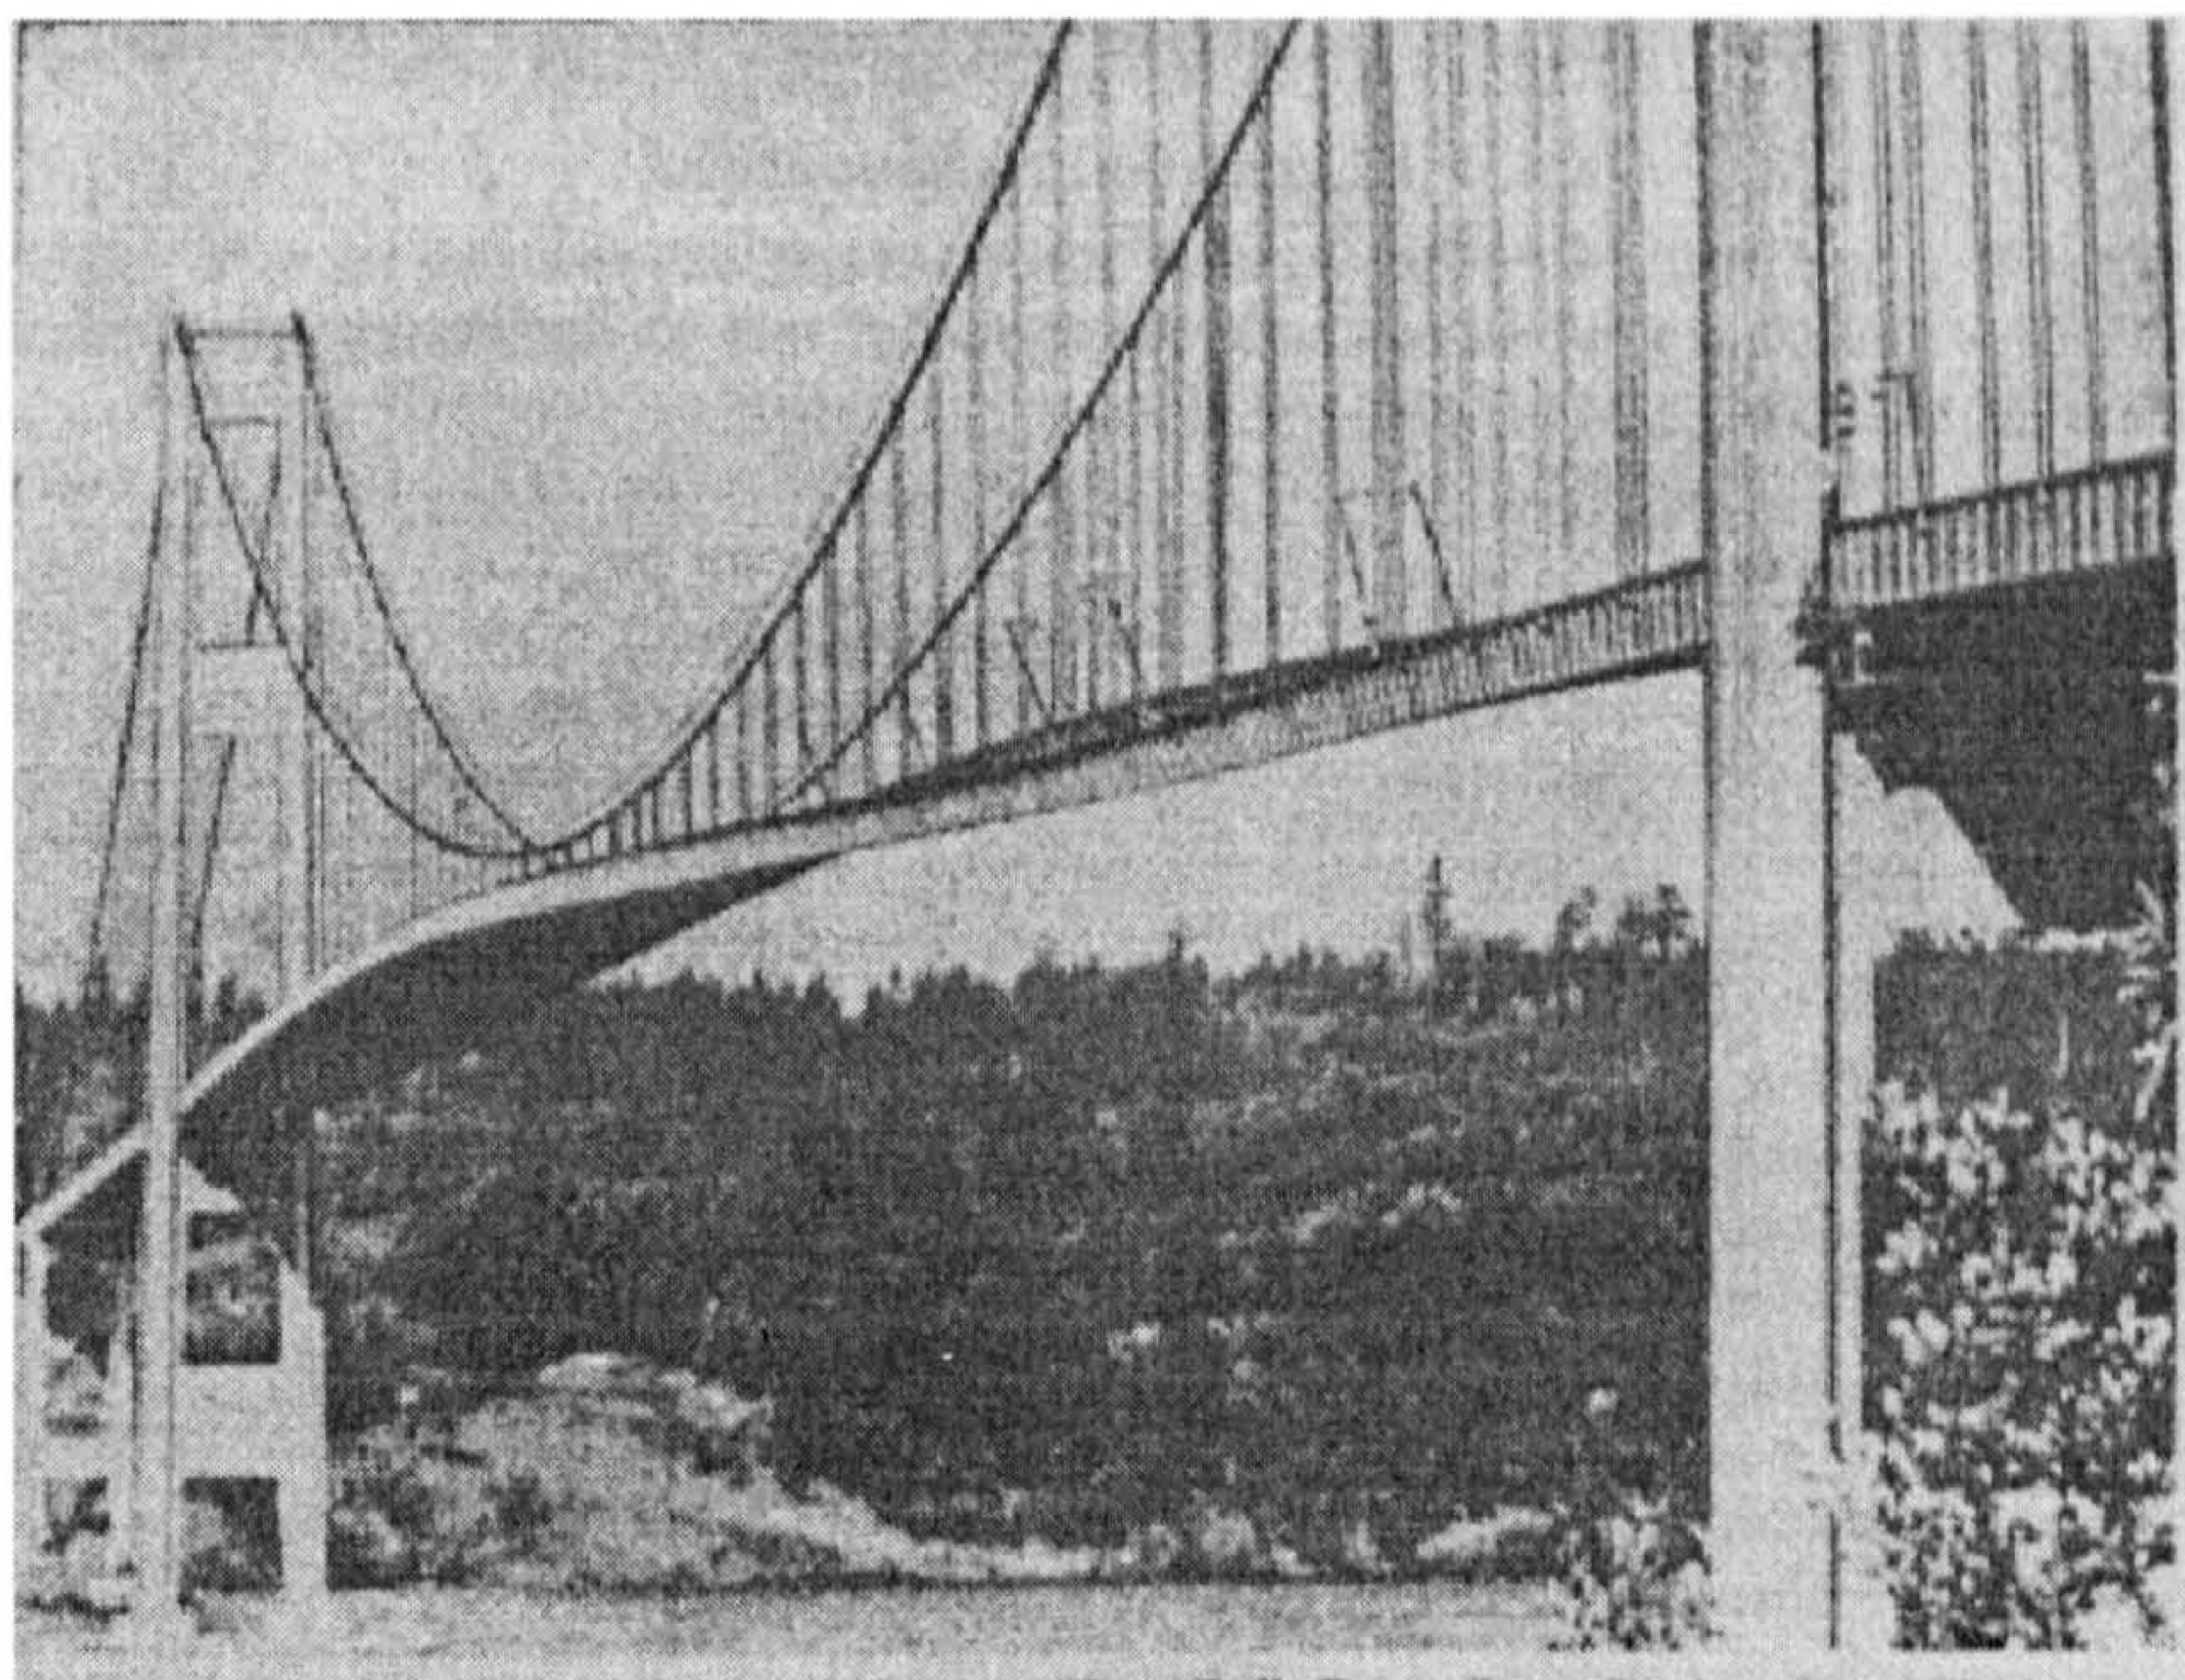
Tacoma Narrows Bridge failure of 1940.
